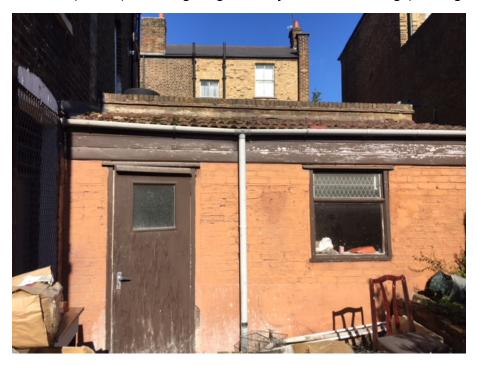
(above): Side (south-eastern) elevation of existing rear closet wing
